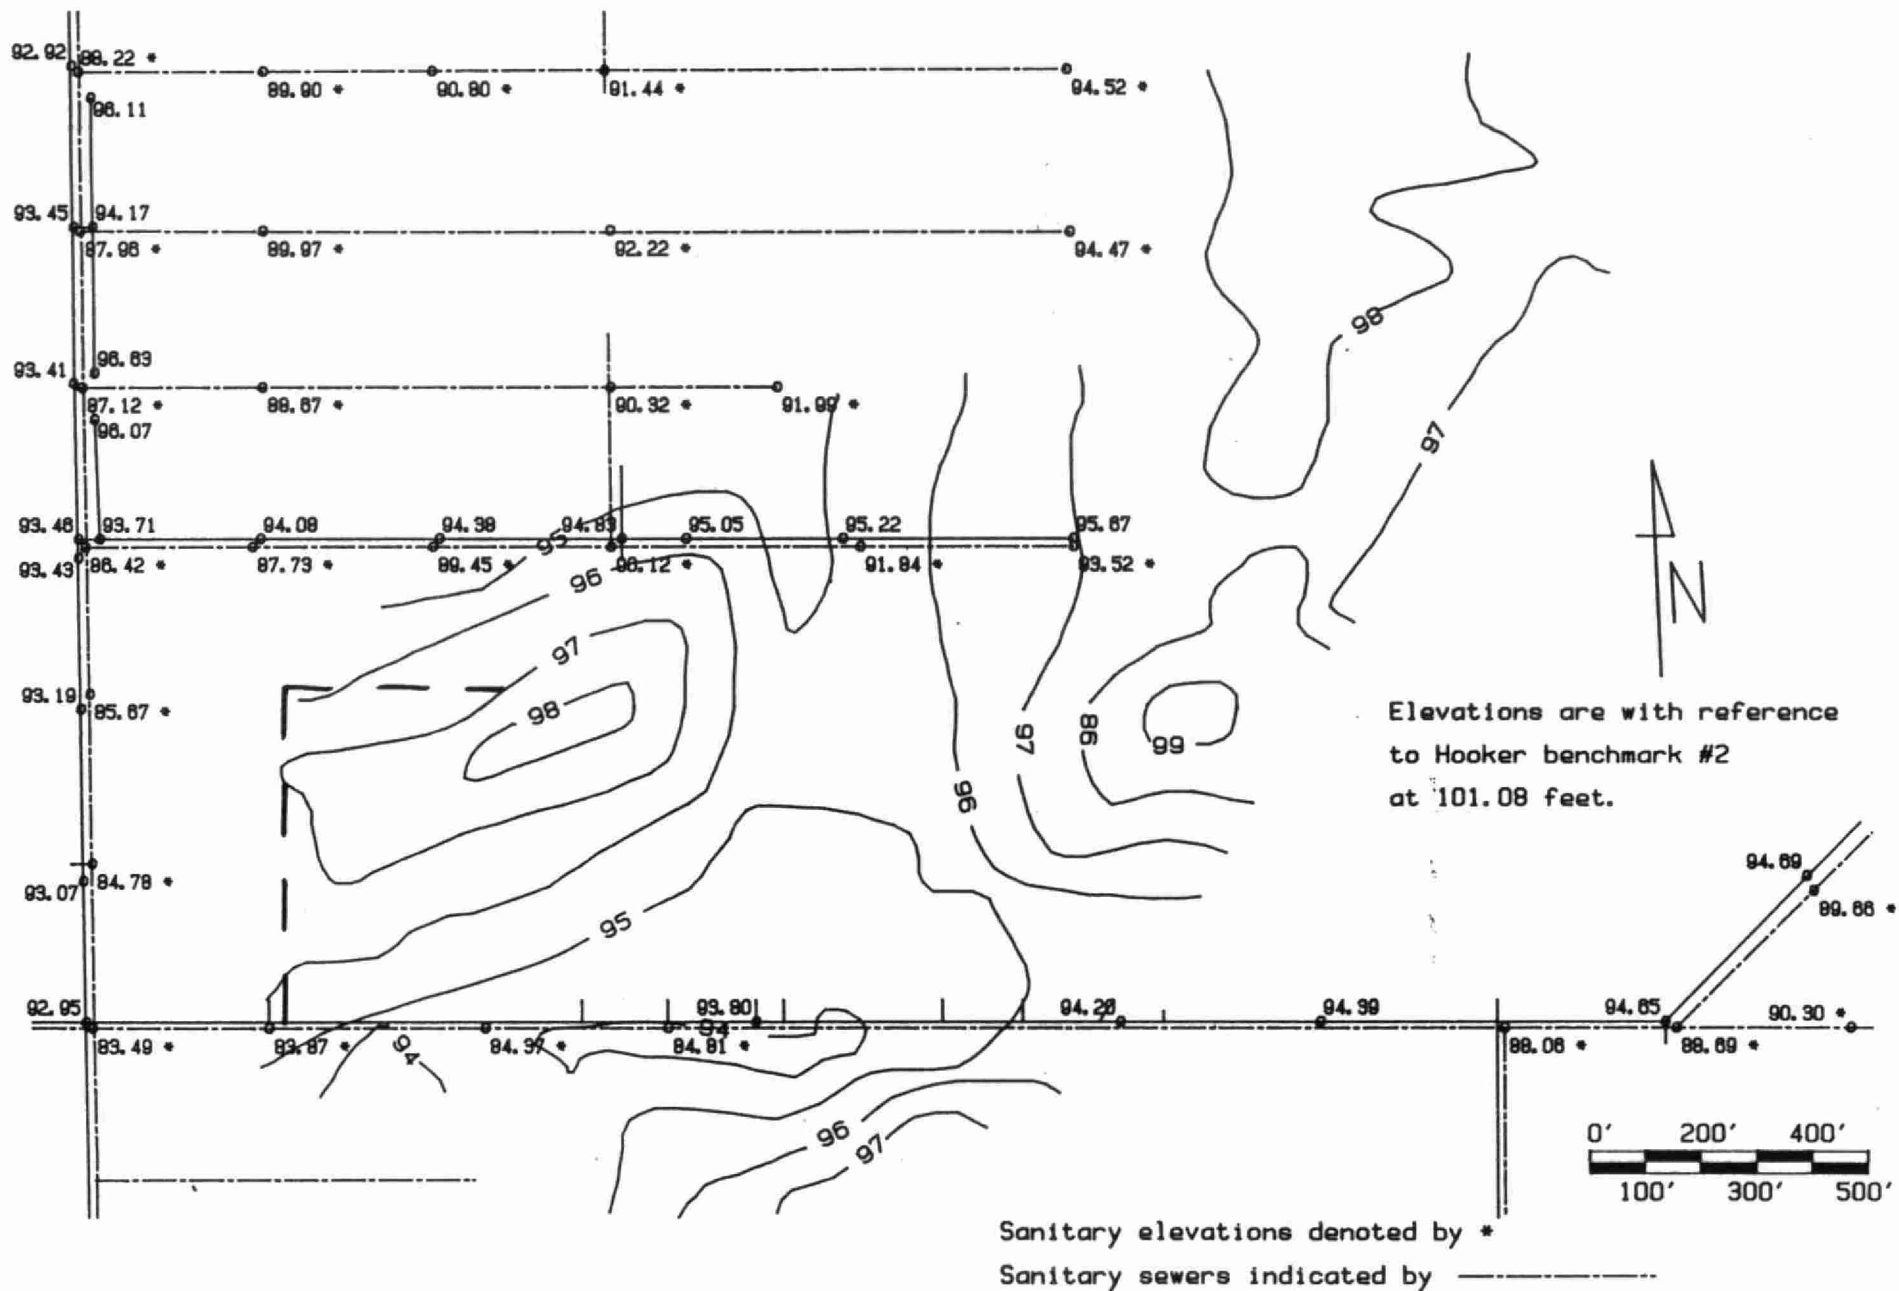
Storm and sanitary sewer system invert elevations and water level elevation contours for June 6, 1982.
